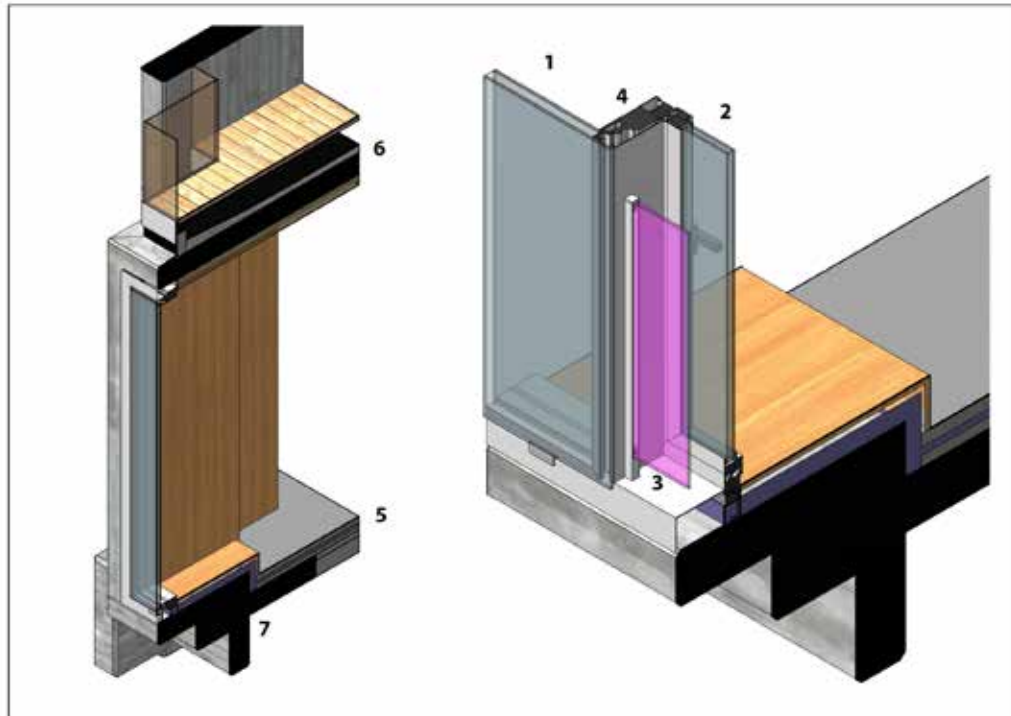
The part of the façade that can be opened is on a second layer in order to overlap the window frames and to minimize the perceived dimension from the outside. 1-unit system façade, 2-window frame, 3-colored laminated glass balustrade, 4-frames overlapping, 5-floor insulation, 6-ceiling insulation
